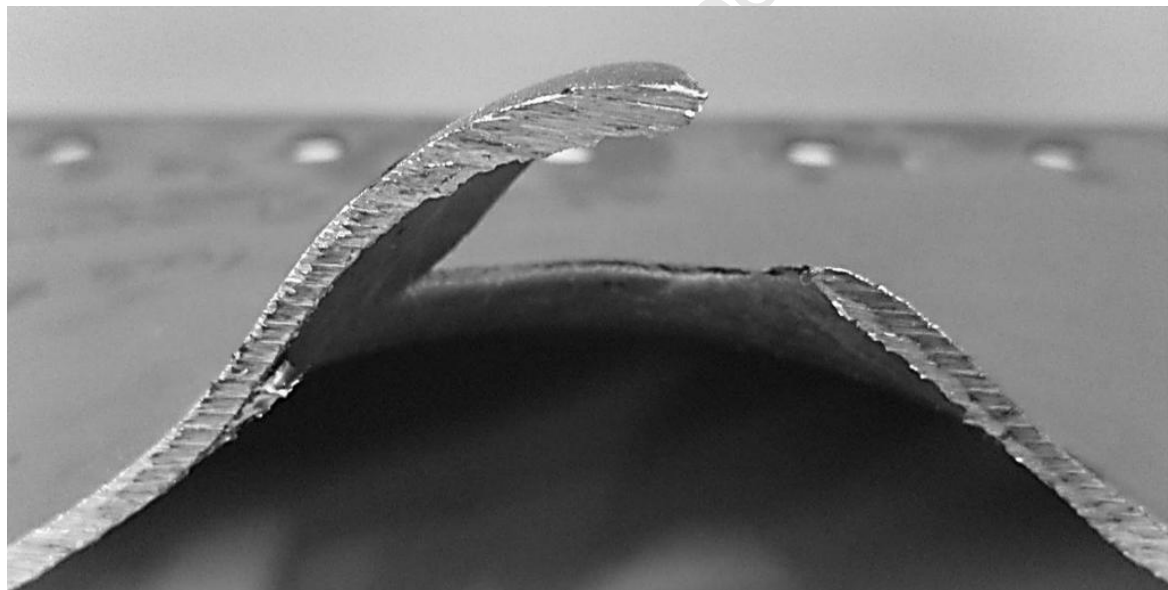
Photograph showing opposite cross-section deformation profile of MS400-15, subjected to a blast load of 33g at 38sod
